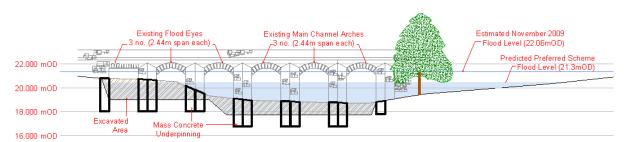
Proposed Works at the Old Pedestrian Bridge in Craughwell
